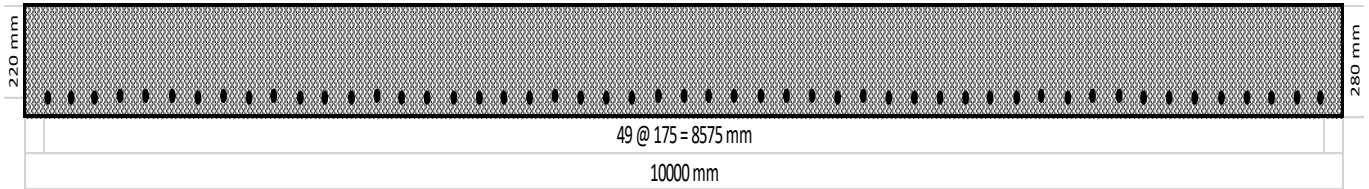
Main bar arrangement of 175-mm in-to-in spacing for the entire 10-m span bridge
